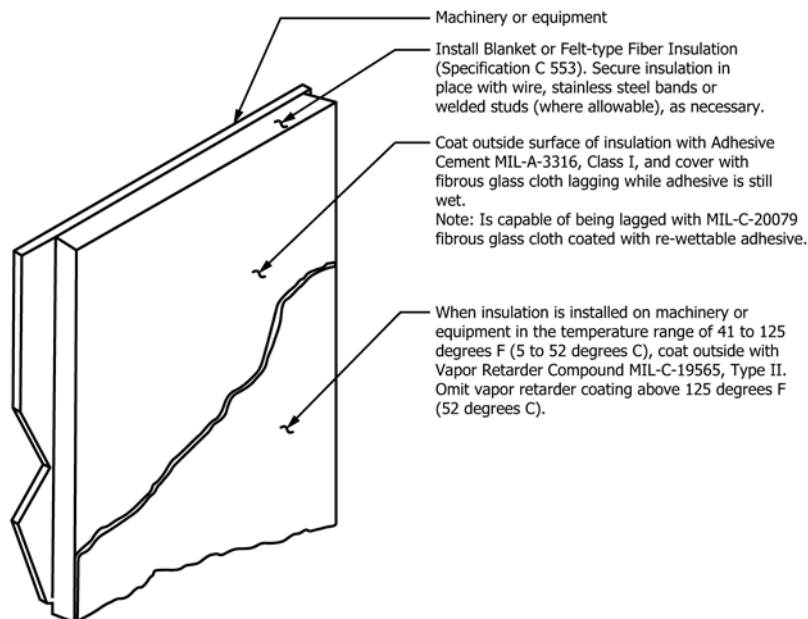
Installation of Mineral Fiber Blanket or Felt Insulation (Specification C553) on Machinery or Equipment (400°F Max) (204°C)
